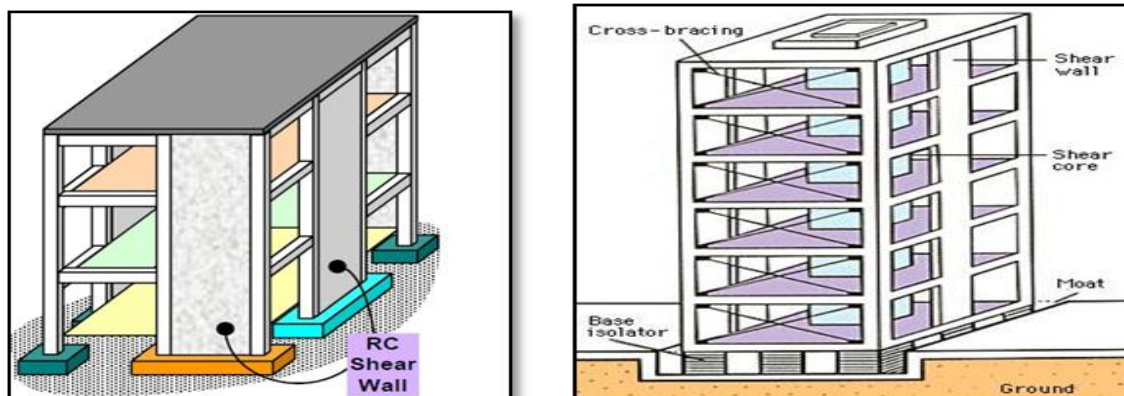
Shear Wall, Cross Bracings, Base Isolator
